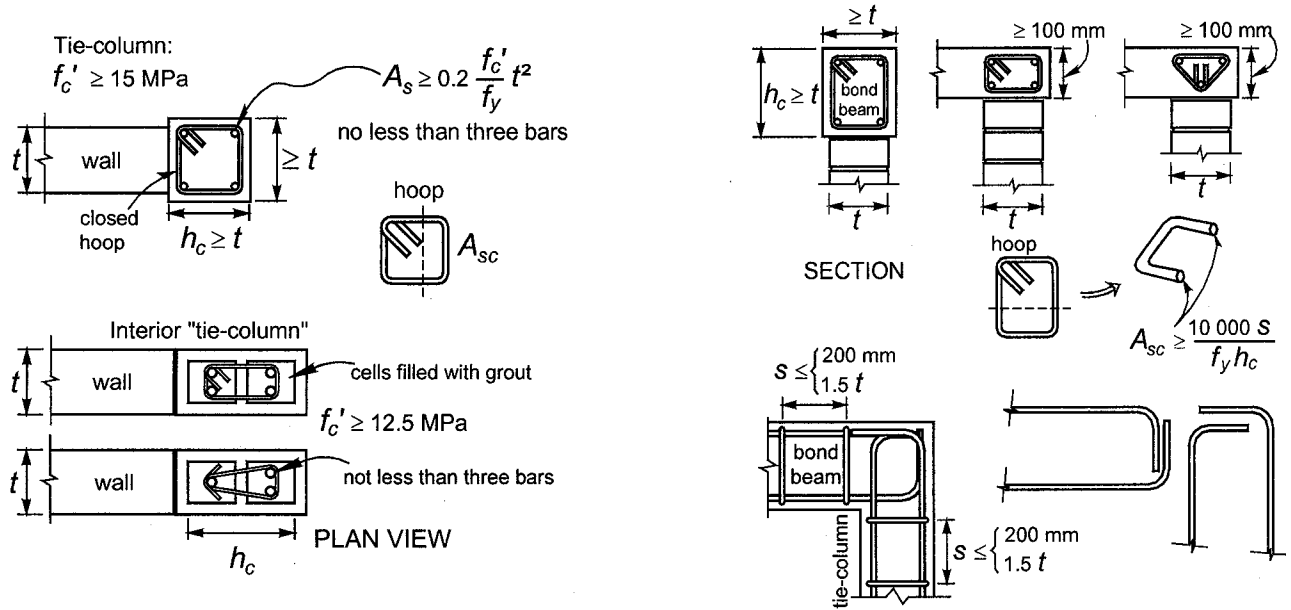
Detailing Requirements for Tie-Columns and Bond Beams
